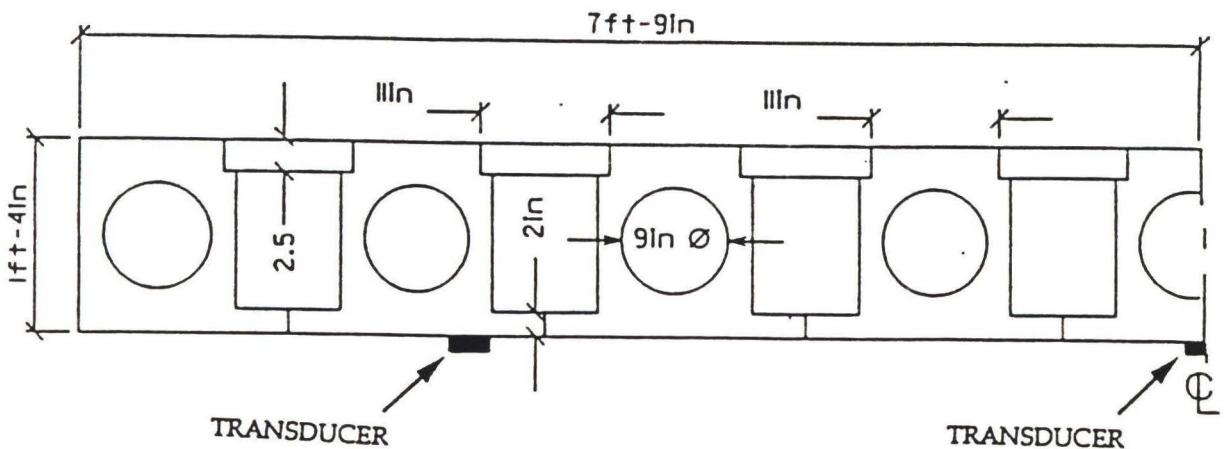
Sectional view of the multi-box beam bridge model.
